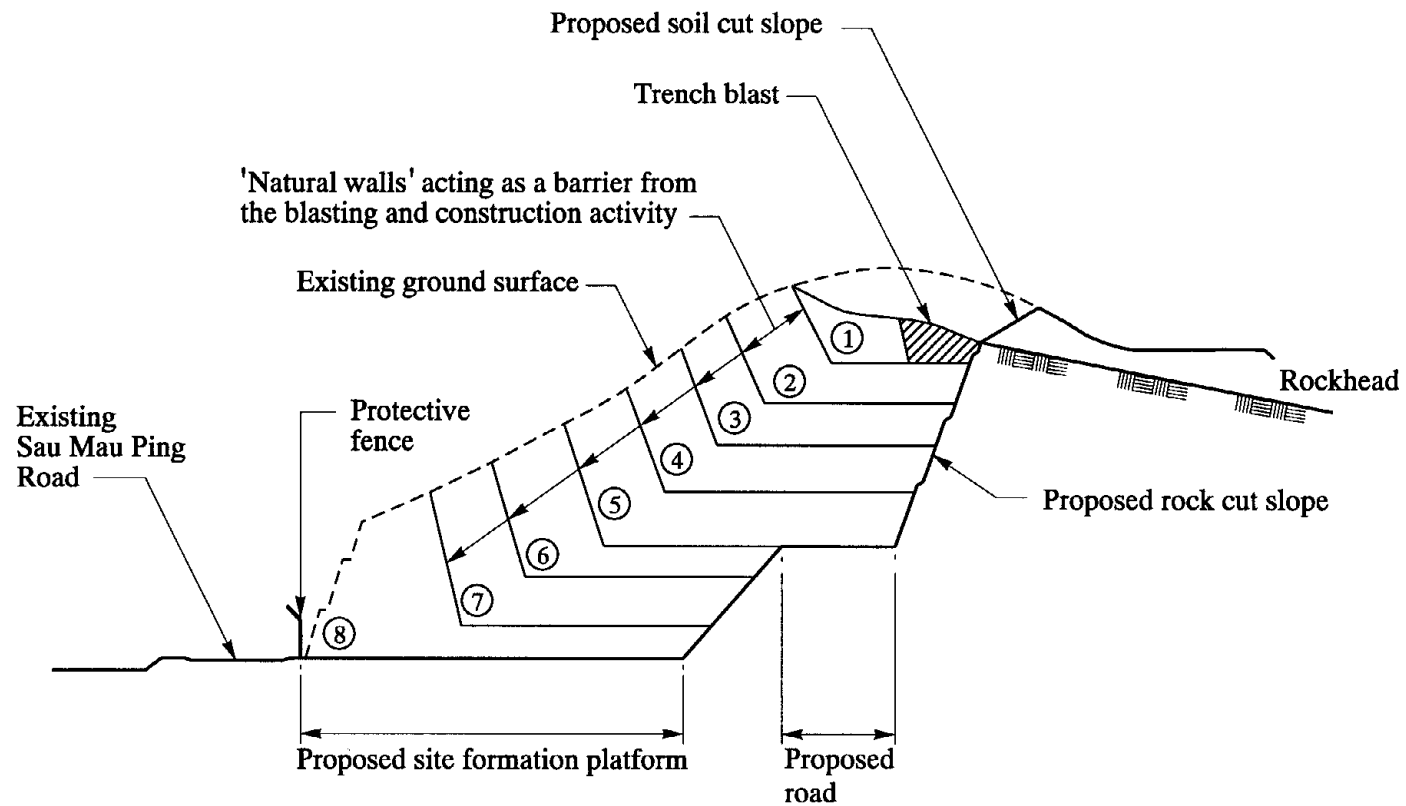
Proposed Typical Sequence of Excavation in Rock
